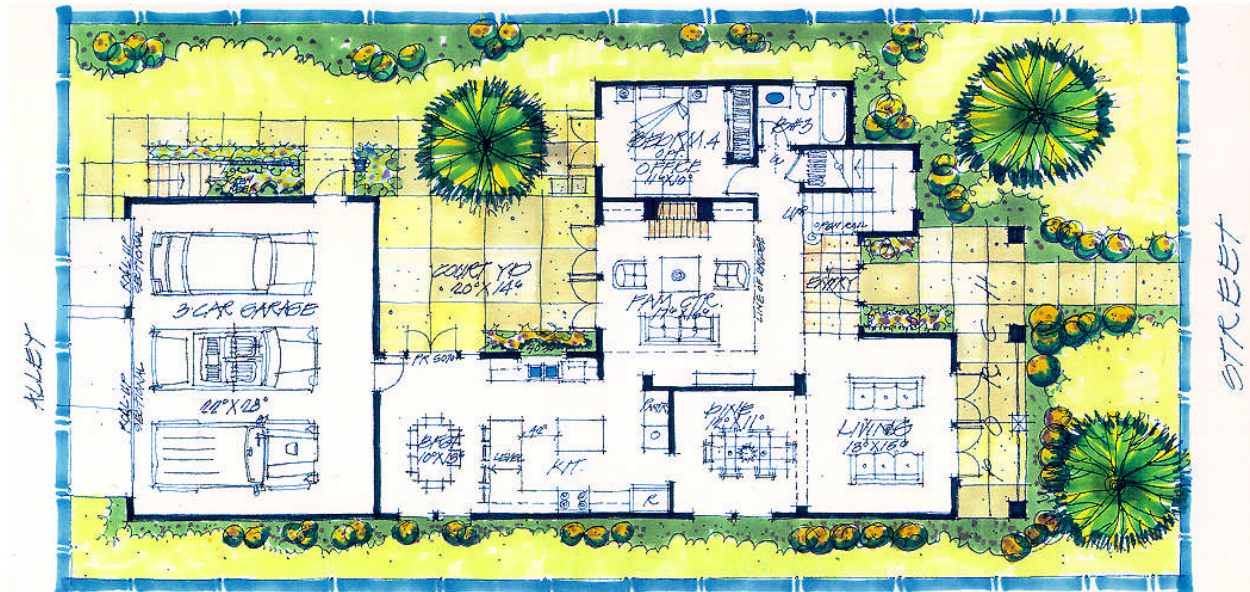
Two Story House Alley Access - Rendered plan of ground floor and site conditions
